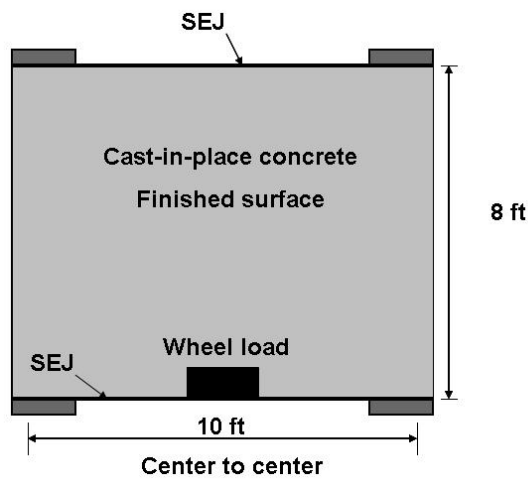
Construction of Positive Moment Specimens (Plan View)
